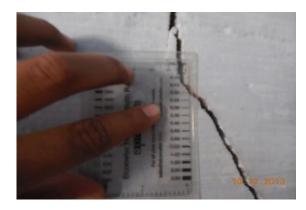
Inclined Crack on Wall No. 2 & 3 of Room No. 14, Second Floor, Approx. Width = 1.5mm, Approx. Length = 2m. Distance from = Corner Wall No.2 & 3m, Height from Floor = 0m.
